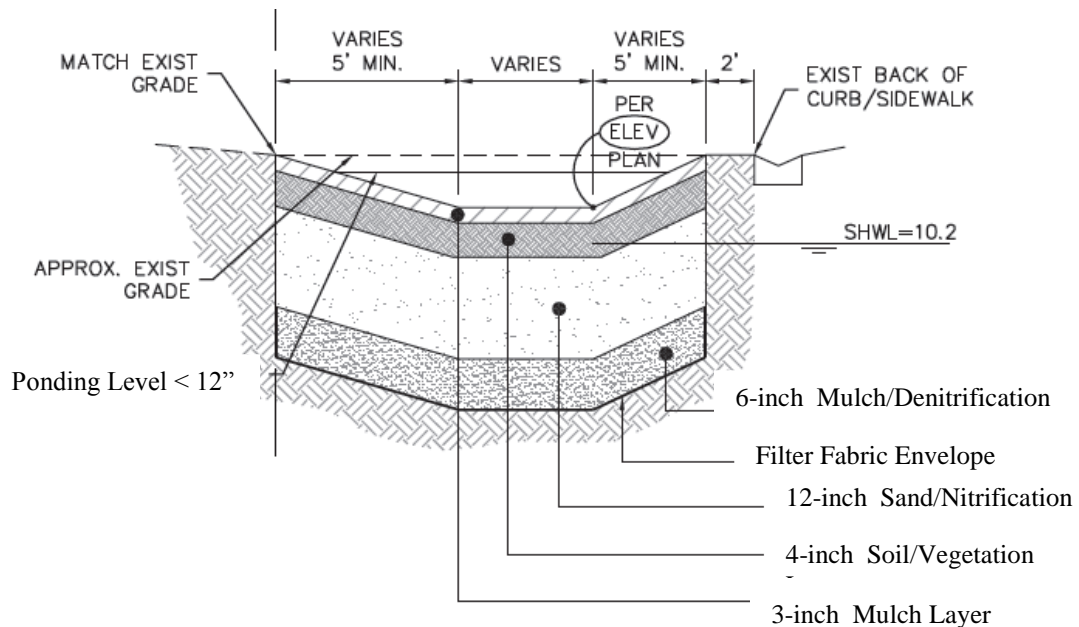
Site plan of bioretention cell 13 [plans provided by Sarasota County].
